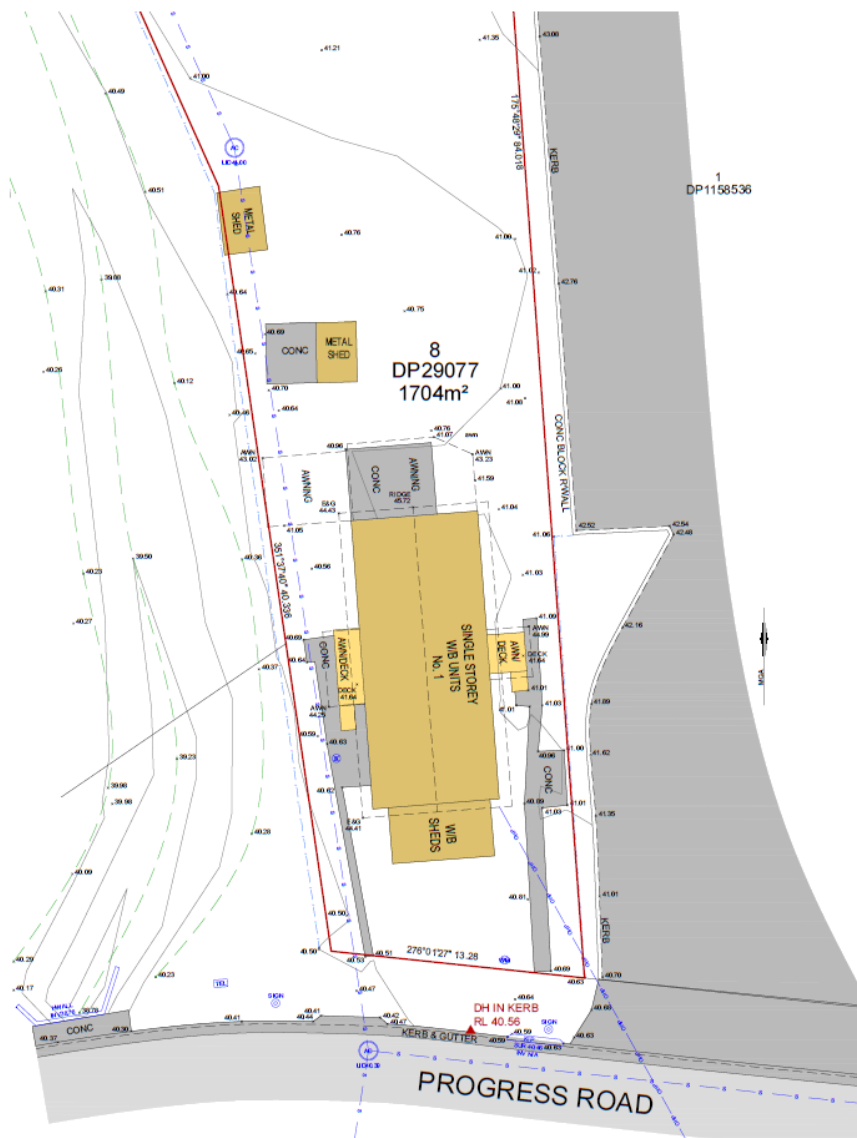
Existing Site Layout and Access, 1 Progress Rd, Mt Hutton
